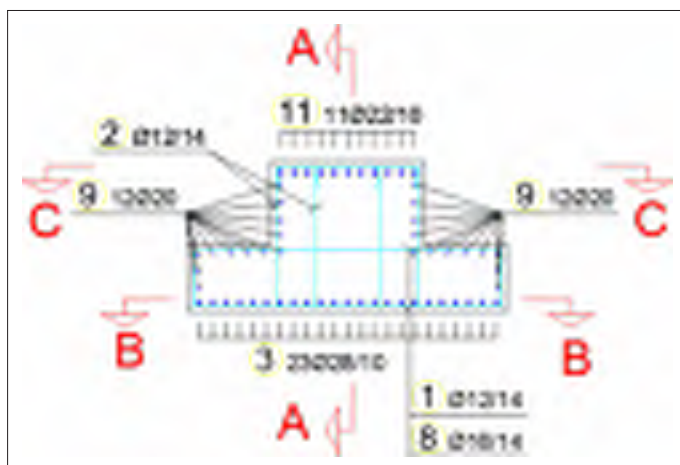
Cross-section of the crane track foundation with reinforcement [3]
